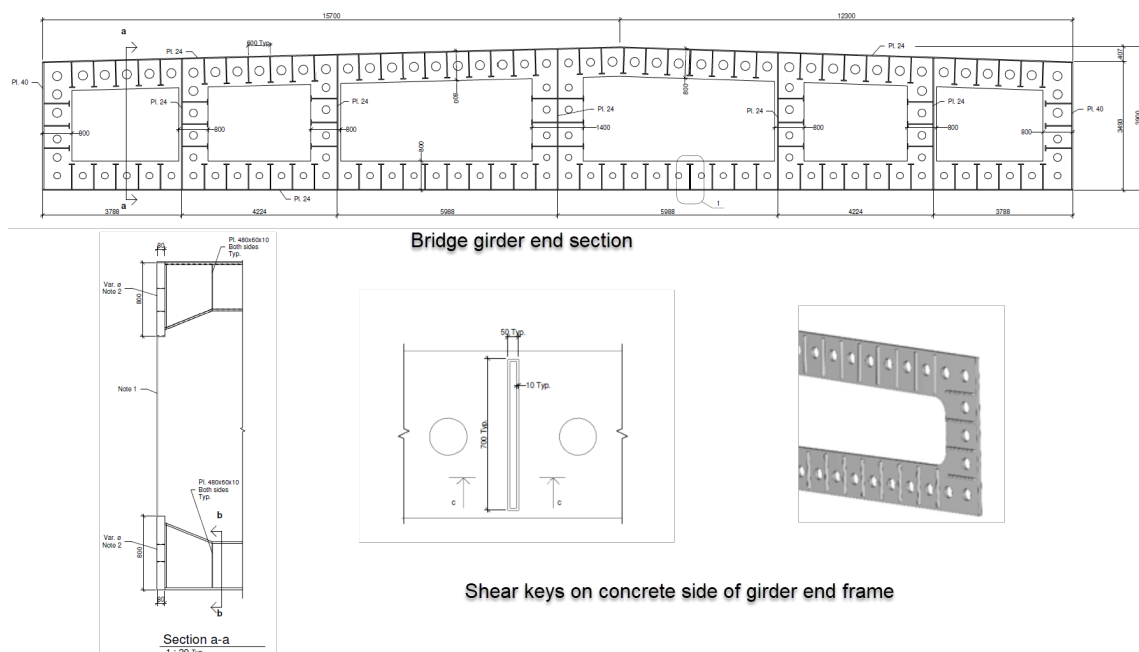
Bridge girder end section towards abutment north. Front view and section.
